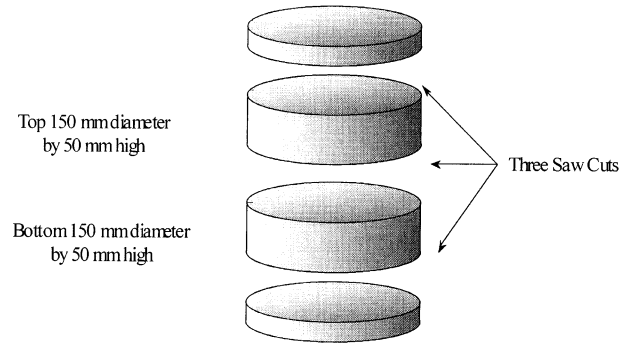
Manufacture of shear test specimens from gyratory specimen.
